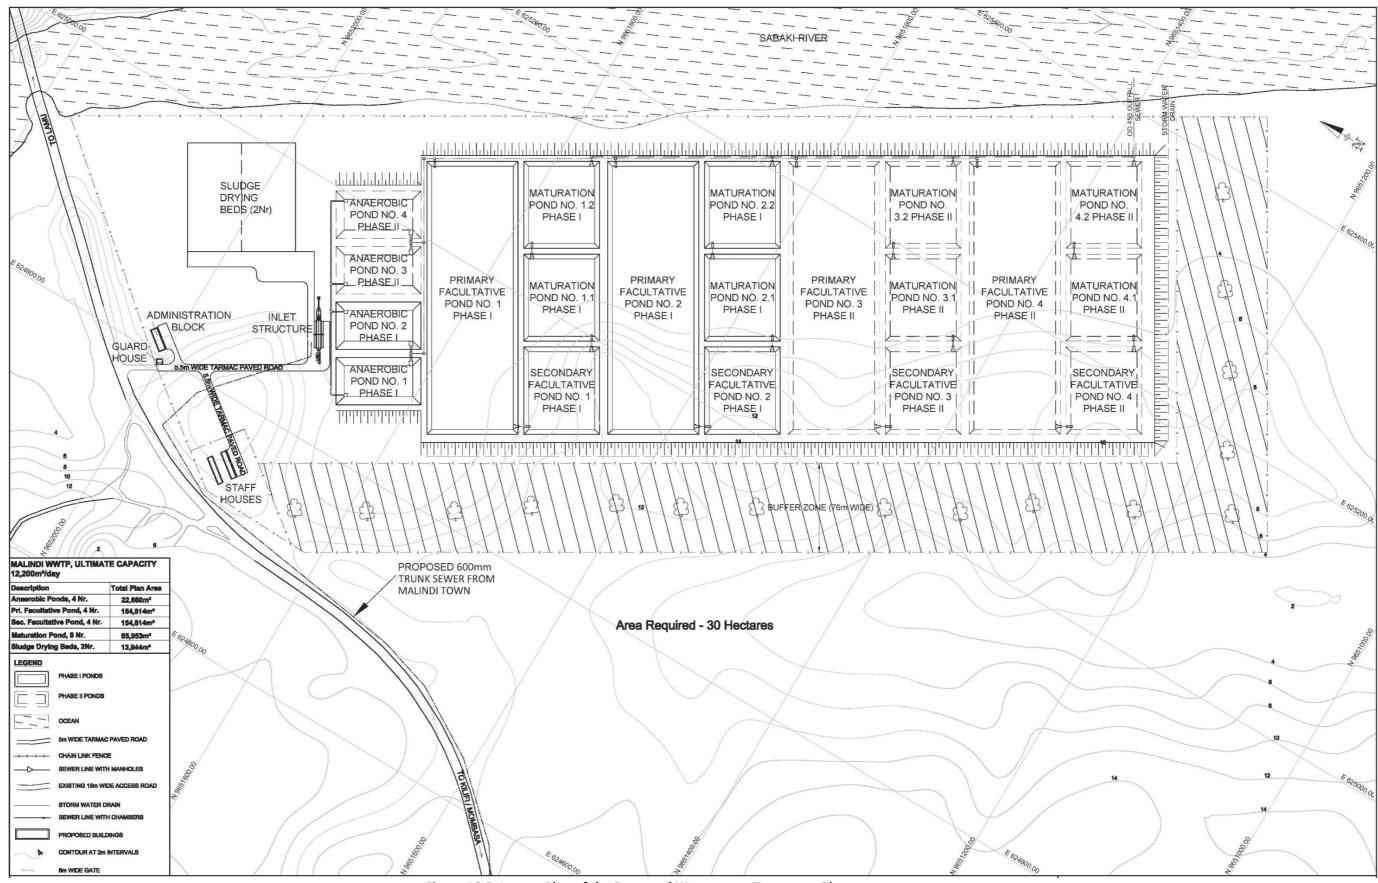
Layout Plan of the Proposed Wastewater Treatment Plant
